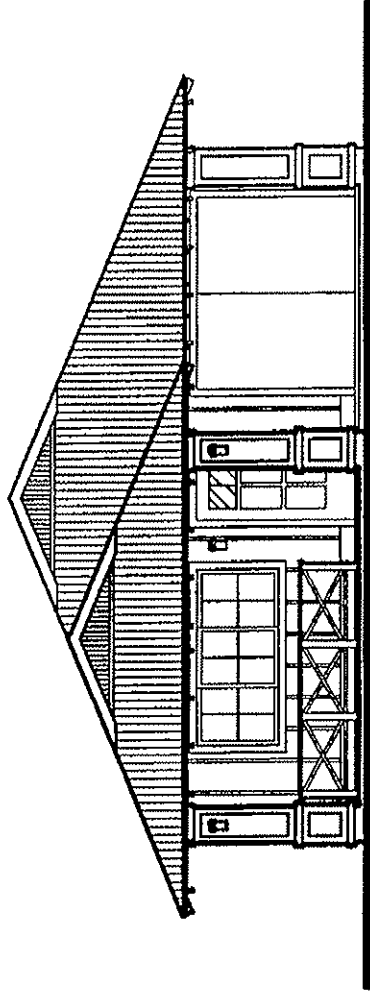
Proposed Kula Ridge Residential Workforce Housing Subdivision NOT TO SCALE
